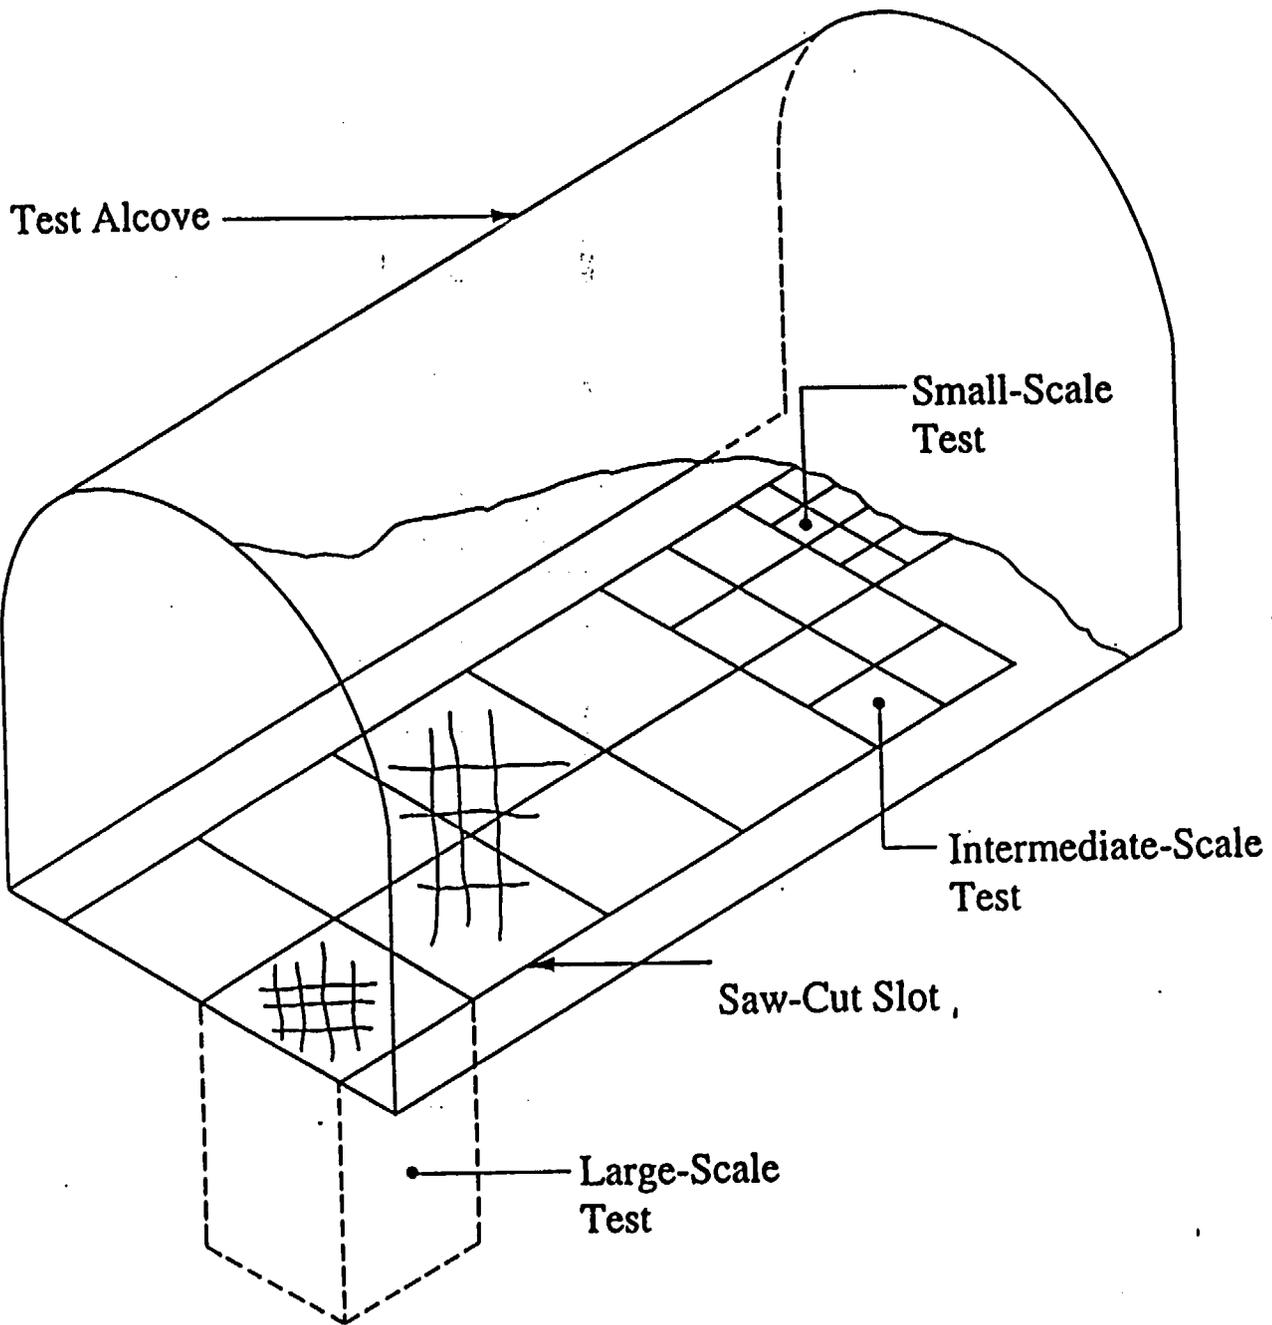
Layout of test alcove for vertical tests using diamond saw for specimen preparation.
